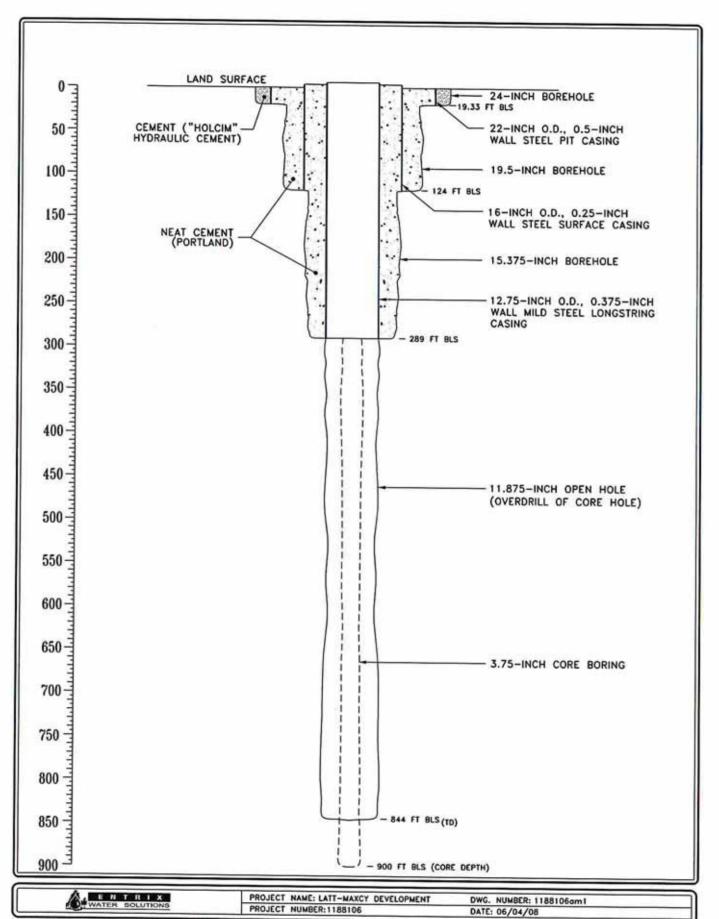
P-1 WELL CONSTRUCTION DETAILS.
